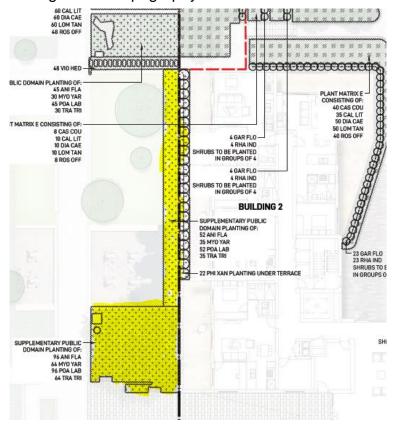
Extract of landscaping plan depicting proposed plantings fronting units which are located more than one metre above the surrounding ground area (in yellow highlight)
